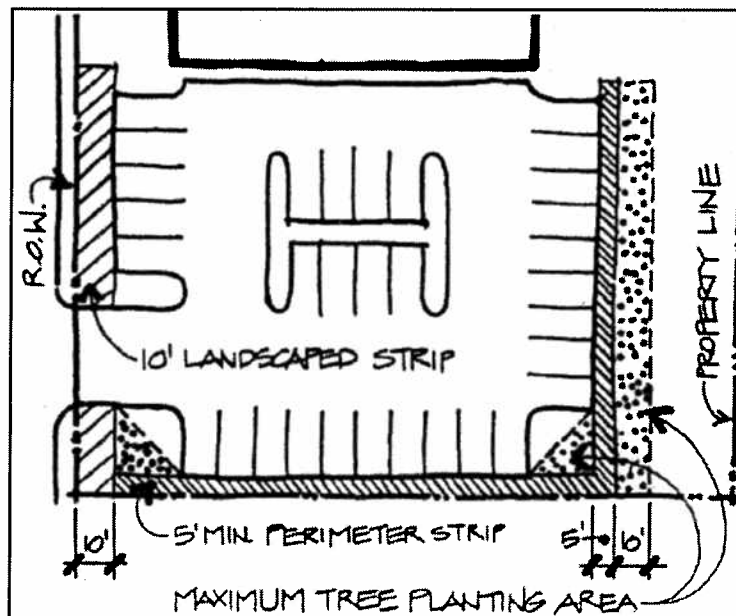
Parking Lot Perimeter (Ord. 99-33, § 1, 8-2-99)
